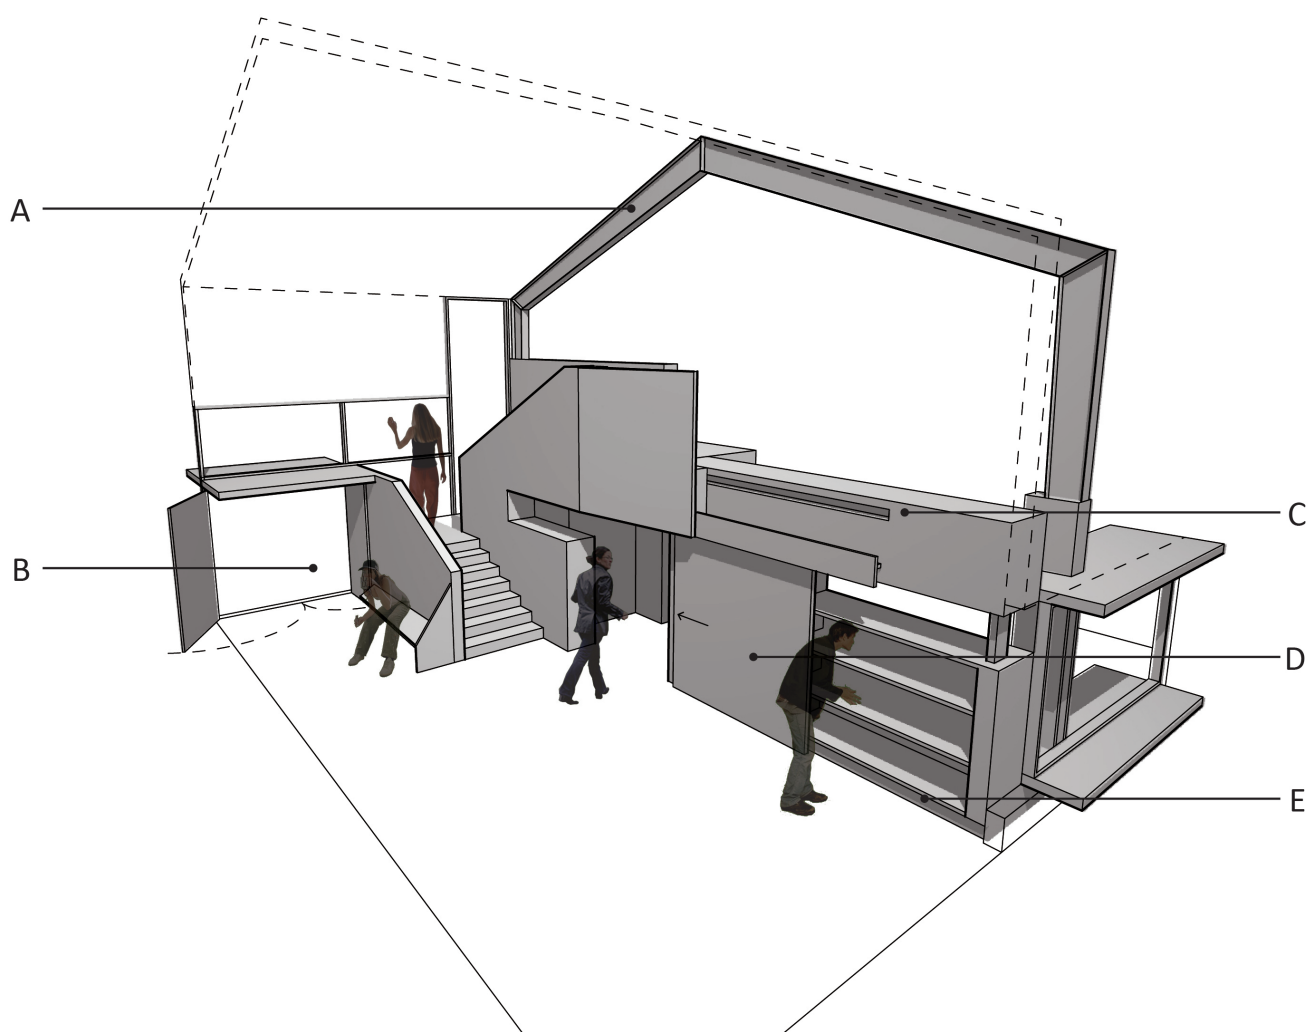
The Auburn House and its use of prefabricated millwork to create an *interior* fabric. A) The prefabricated moment-resisting steel frame. B) Entry area with seating, light shelf, storage, and stair as a continuous element. C) The home will be heated by radiant floor heating, while cooling is delivered to the main zone laterally through the upper area of the casework. D) Face-mounted sliding door can close off the dining room and/or kitchen areas. E) Electrical systems are introduced through the casework from the basement below and routed directly to A/V junctions and integrated lighting.
